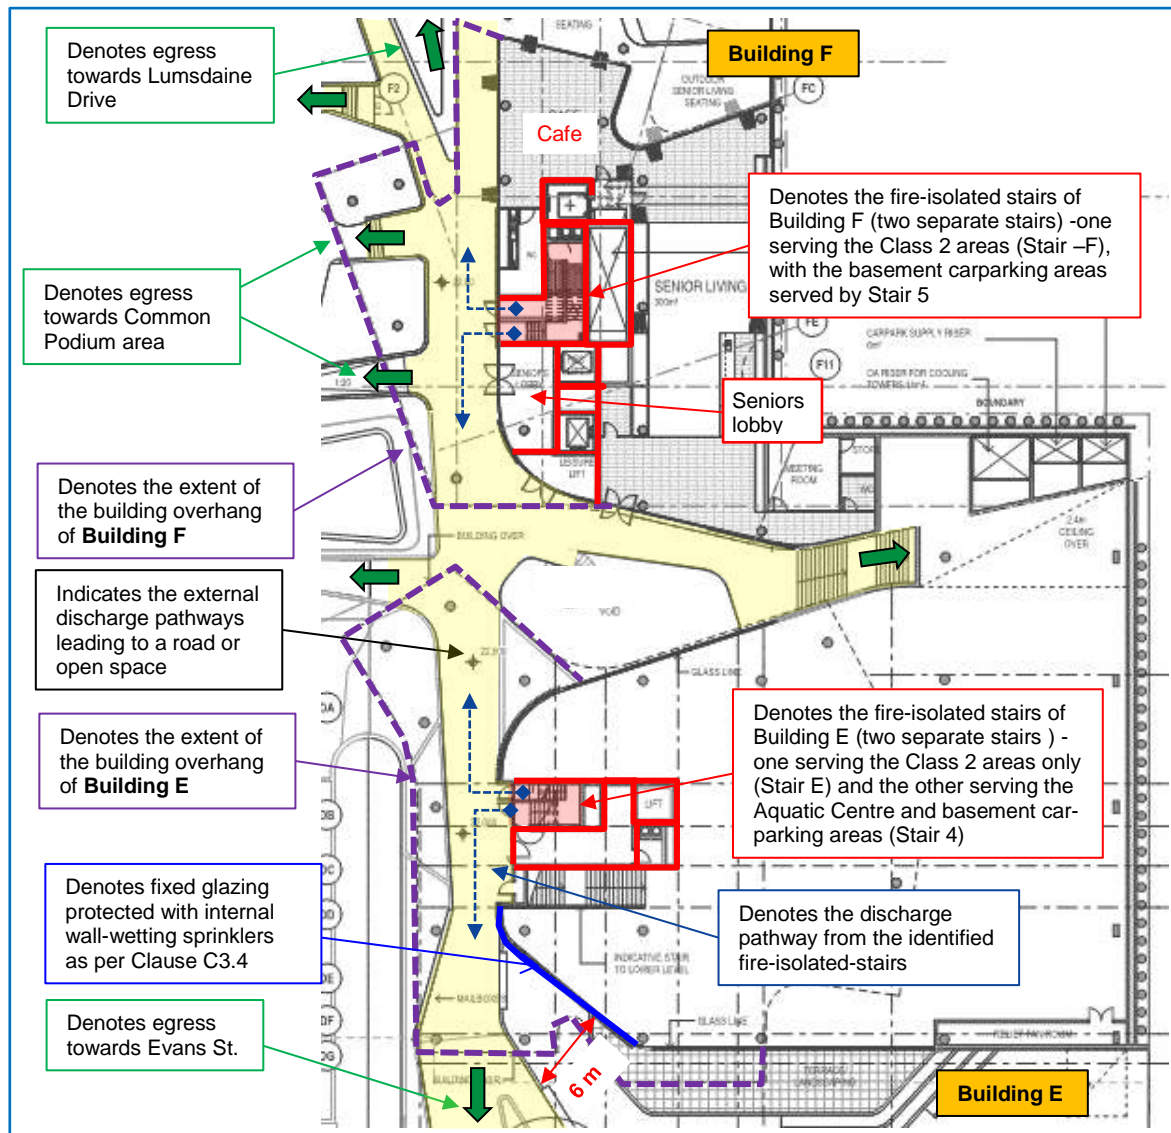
Building E & F (Upper Ground Floor Level) – discharge of fire-isolated stairs
